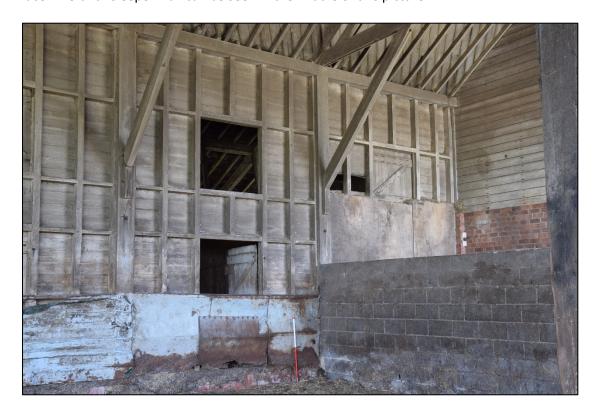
Detail of the slots and plank partition below one of the tie beams in the barn
